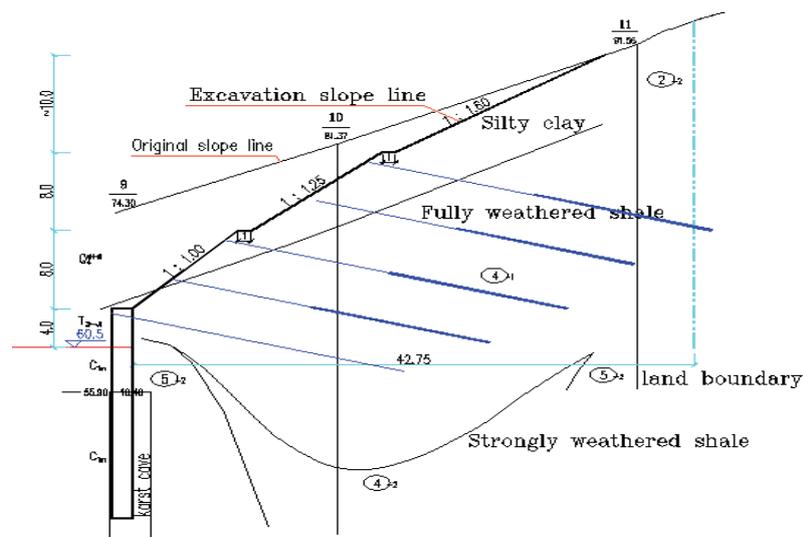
The typical section of the slope stability calculation and reinforcement design (unit:m)
